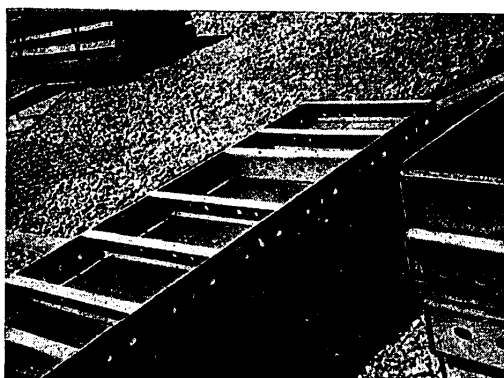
Panels of stock forms made of form plywood with the application of bent profiles
